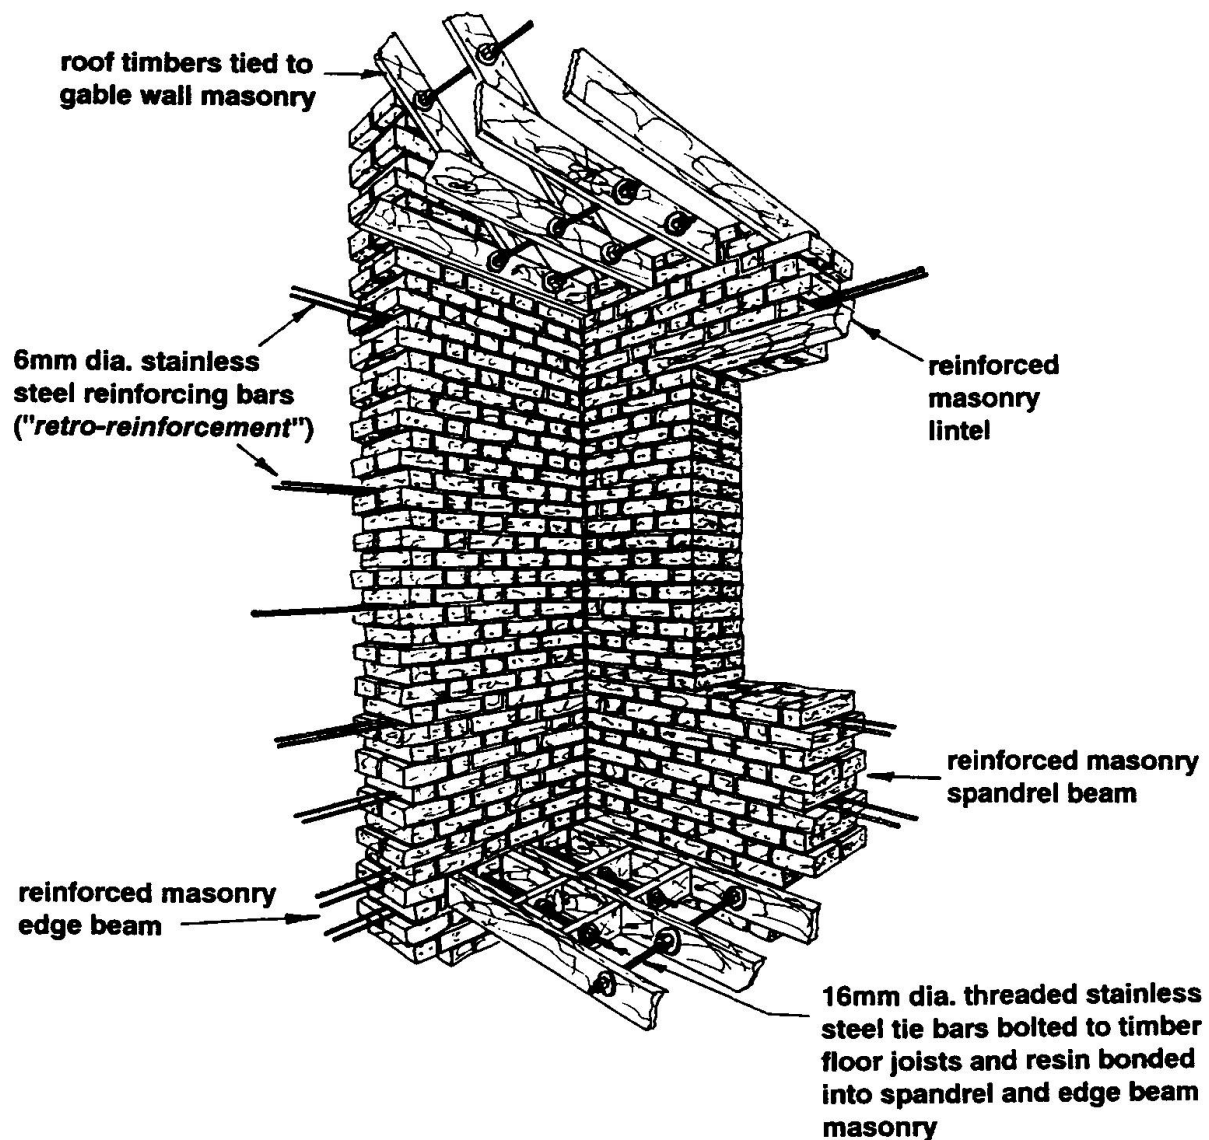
Typical retro-reinforcement repairs to low-rise masonry construction
